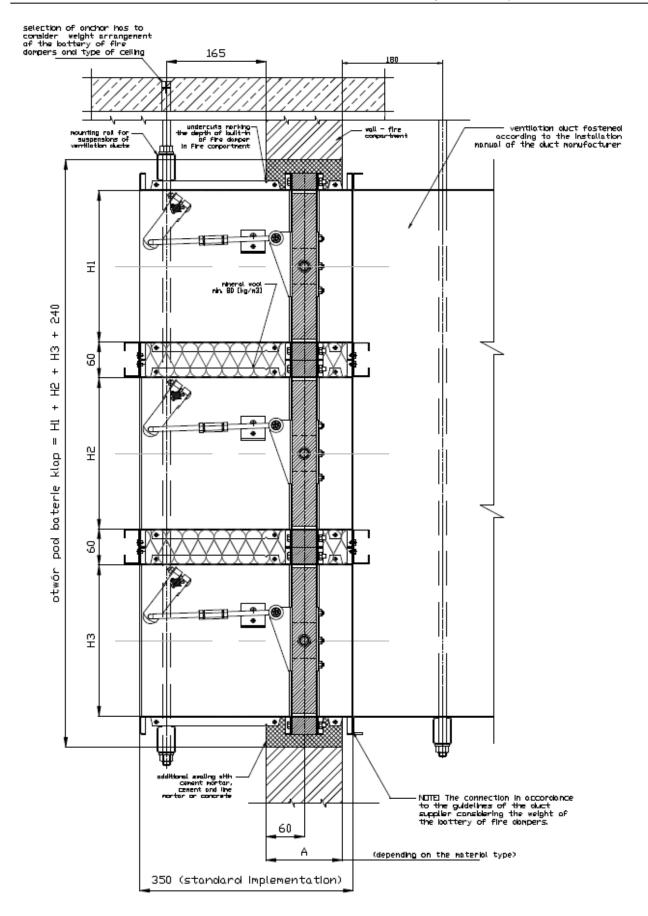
Installation of a battery consisting of three fire dampers KWP in vertical arrangement in rigid barier – side view.
